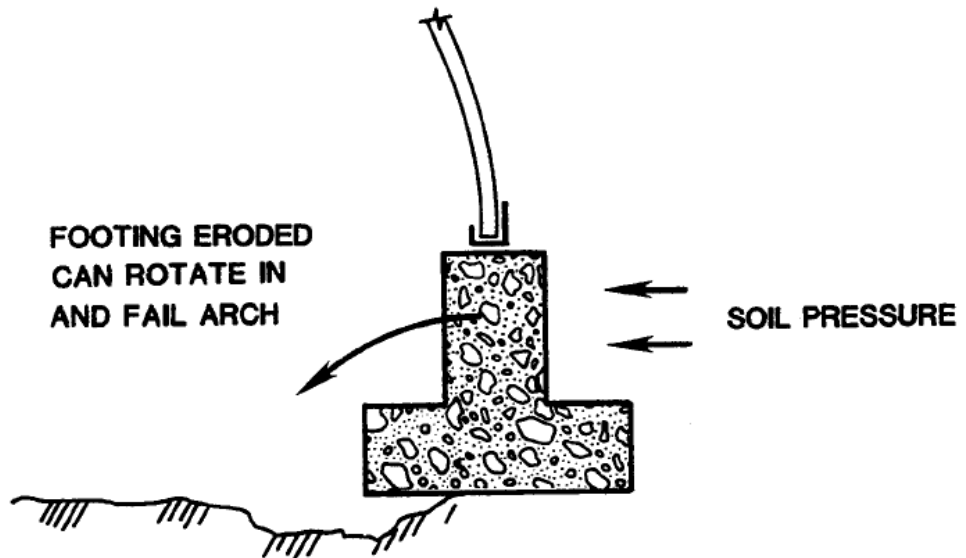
(Exhibit 77) Footing Rotation due to Undermining
